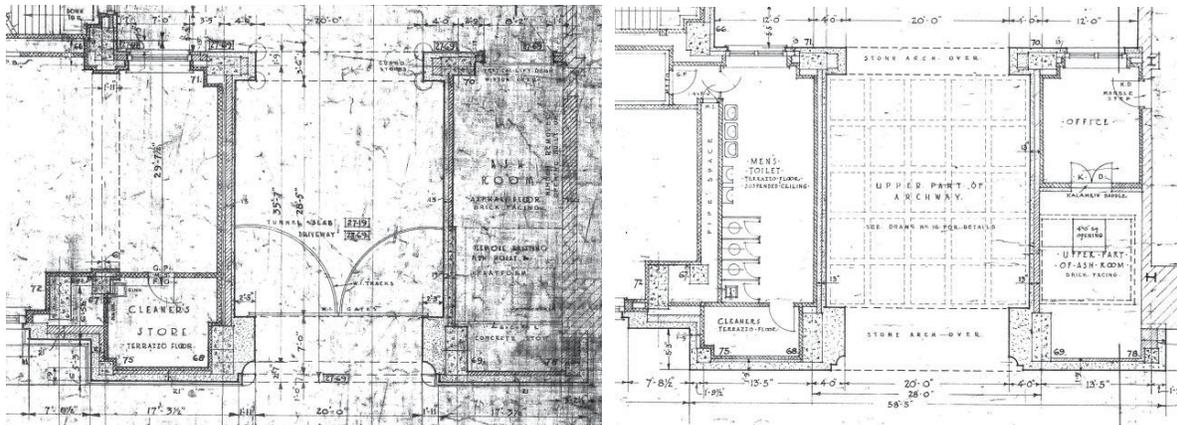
Section-elevation of 7th floor (excerpt from the original drawings, p. 15).
